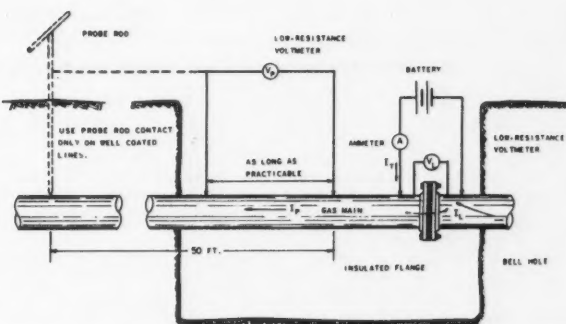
Method of checking insulating fittings by measuring insulation resistance.
